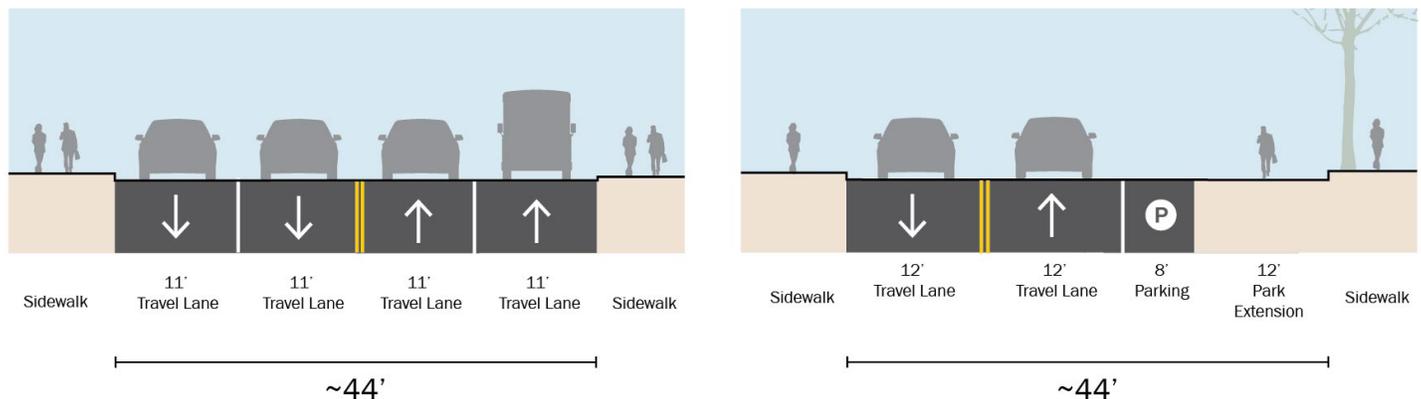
Existing and Recommended Cross Section of Raymond Plaza East (looking north)
